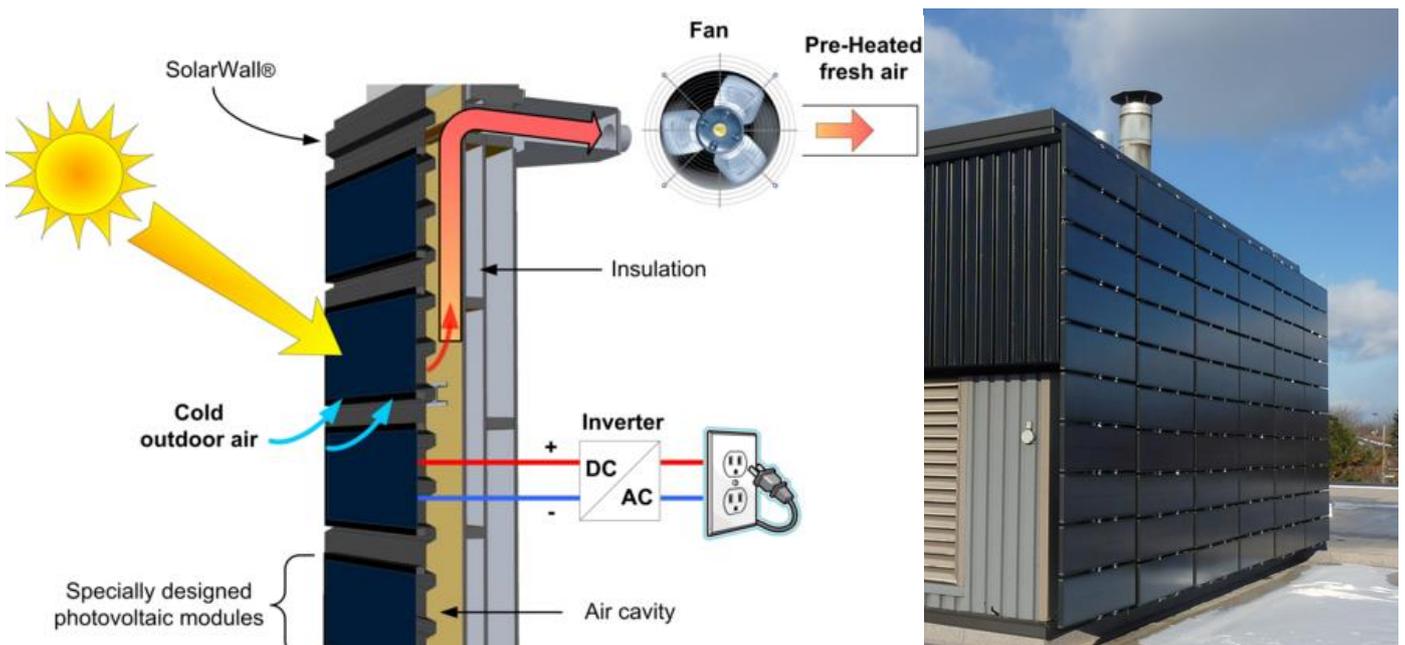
Example of a facade mounted PV-T system (SolarWall, 2015)
